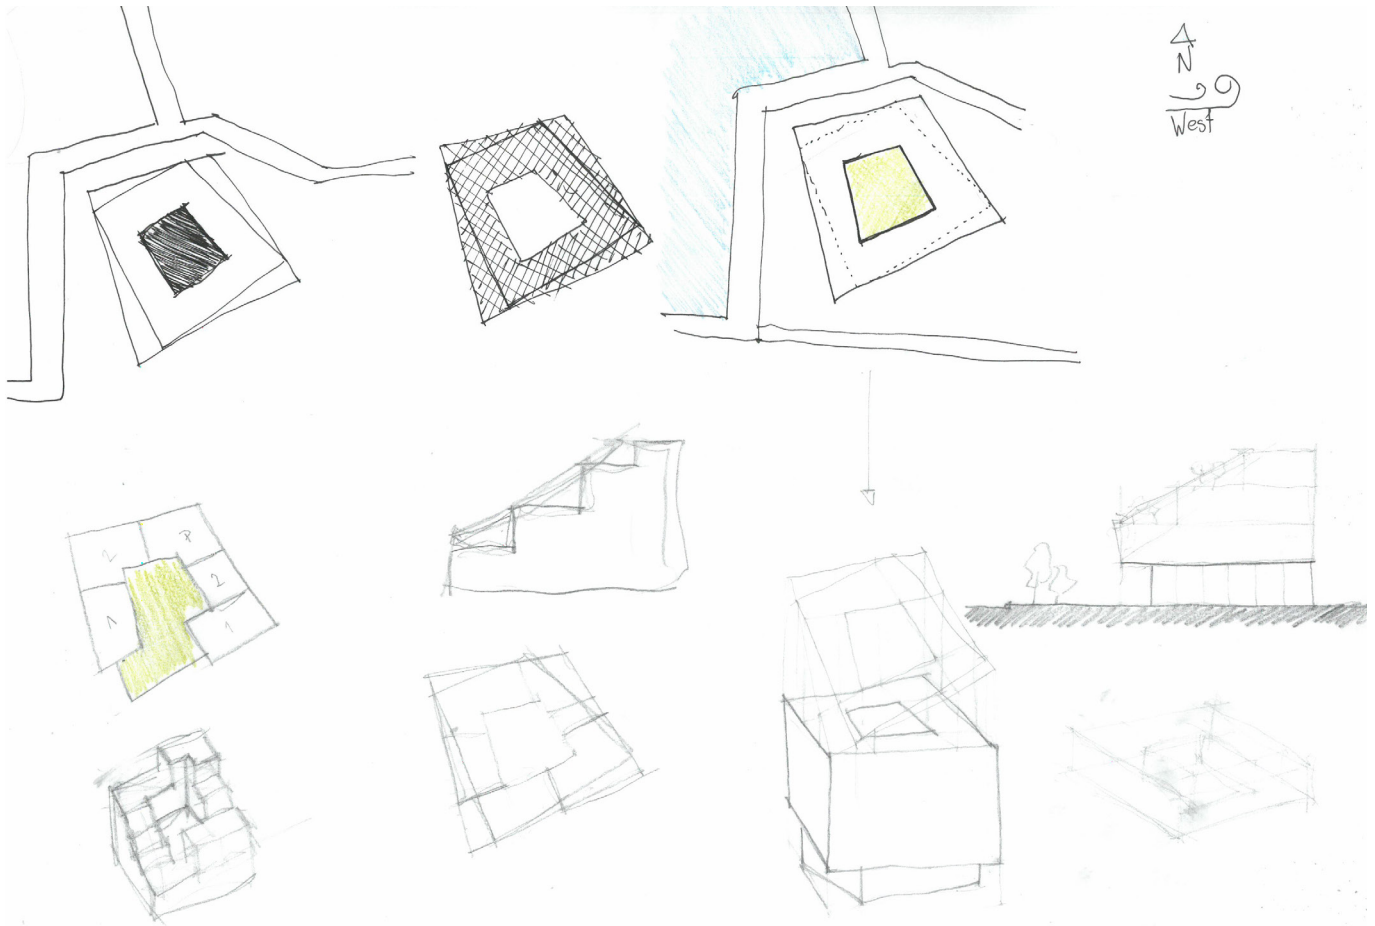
Sketches: shape of the building with the different floor cut to let the sun light in
